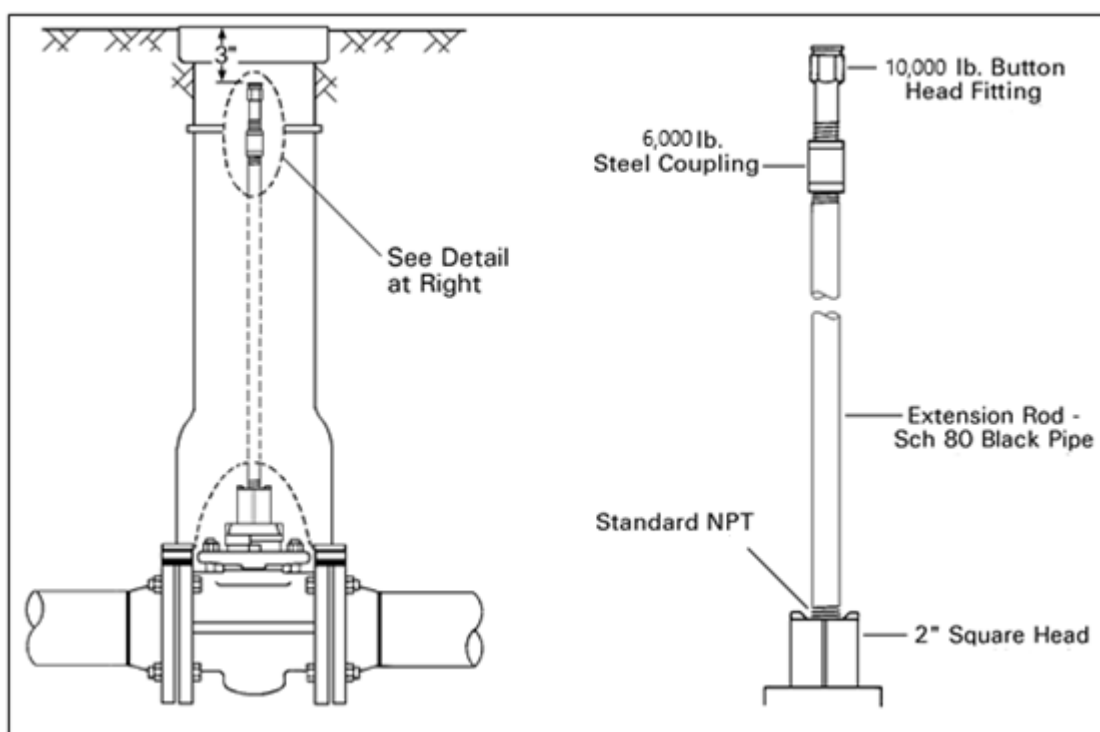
Typical Plug Valve Lubrication Extension Installation
